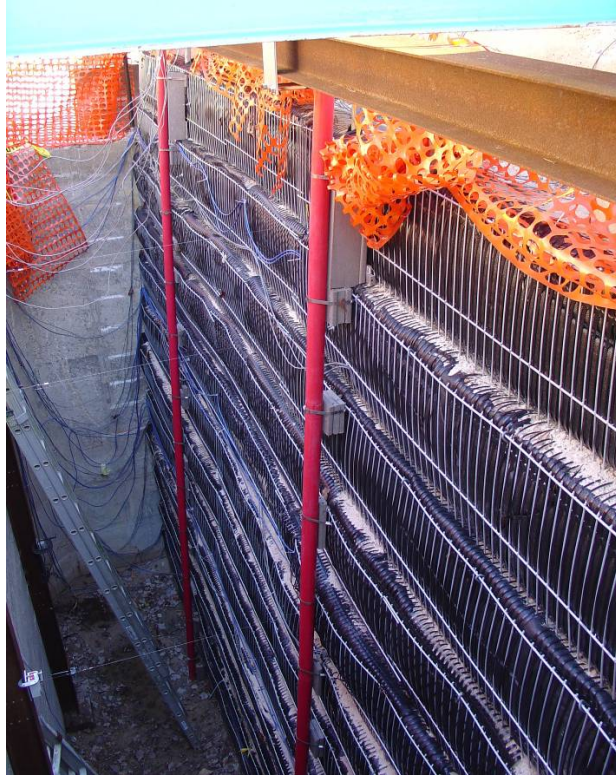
Photo. Inclinometers installed at the face of the MSE wall.
